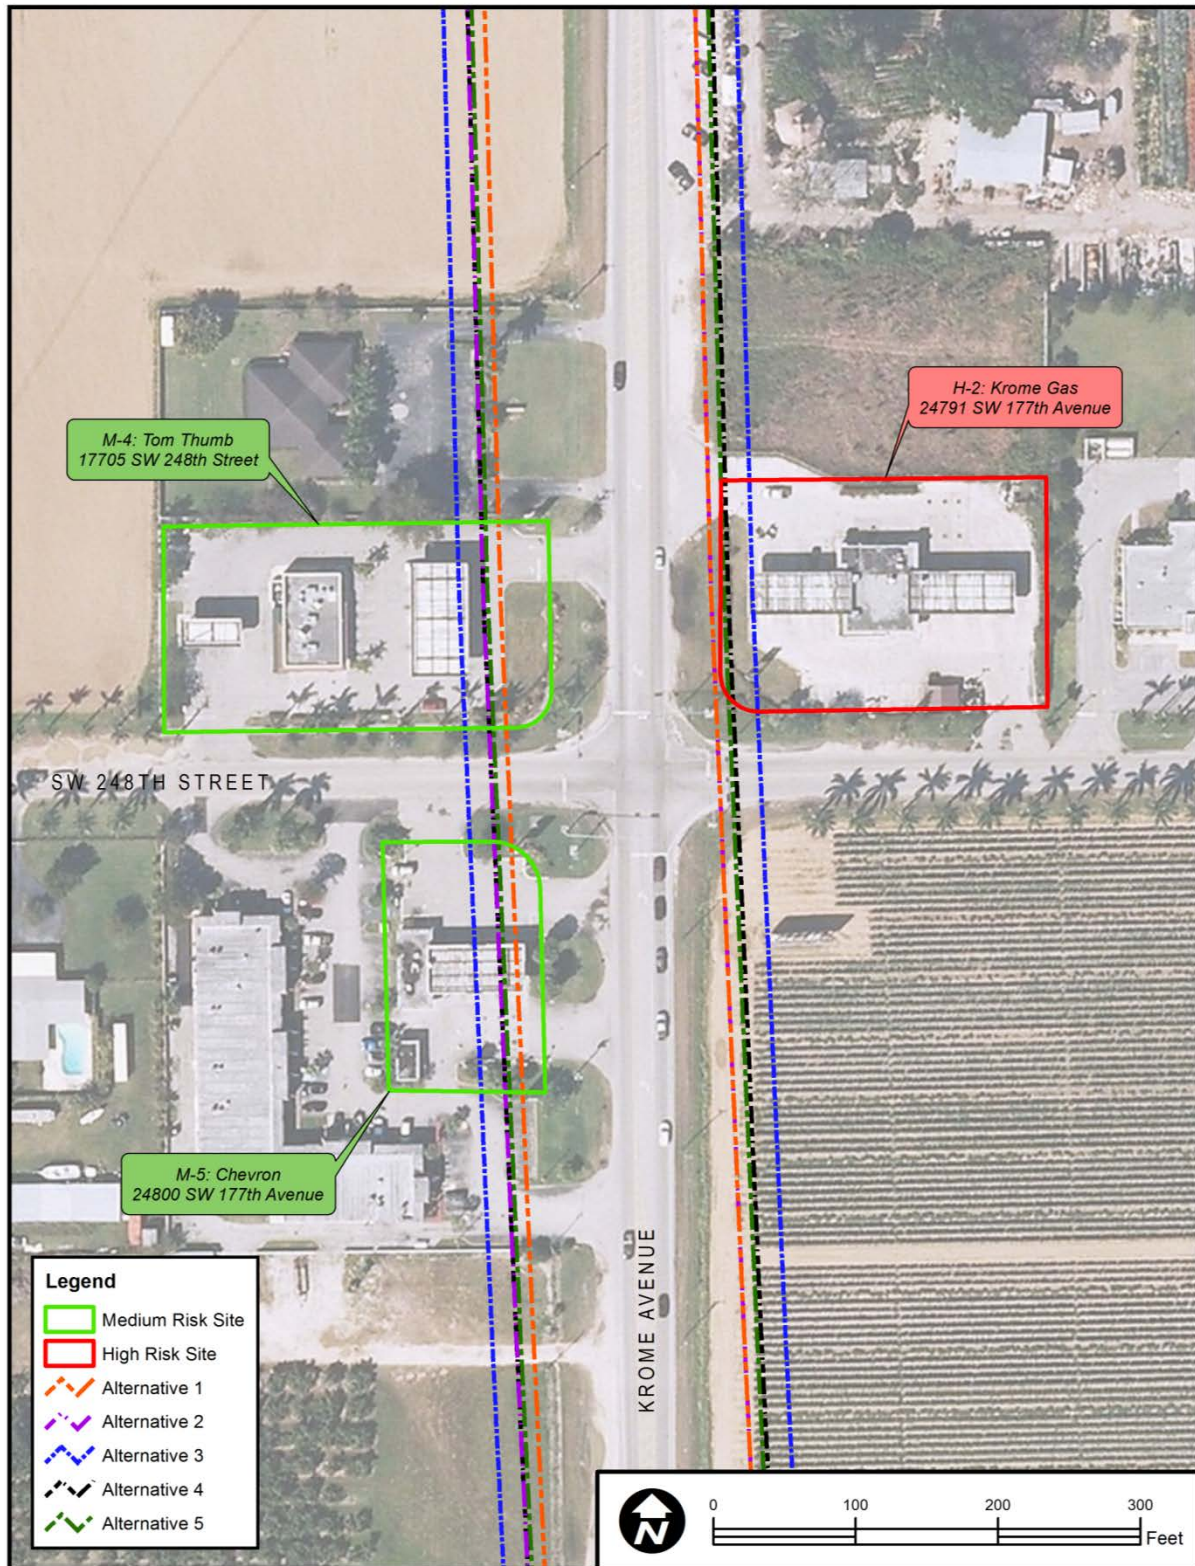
Location of Potential Contamination Concern(s) and Proximity to Proposed Build Alternatives
